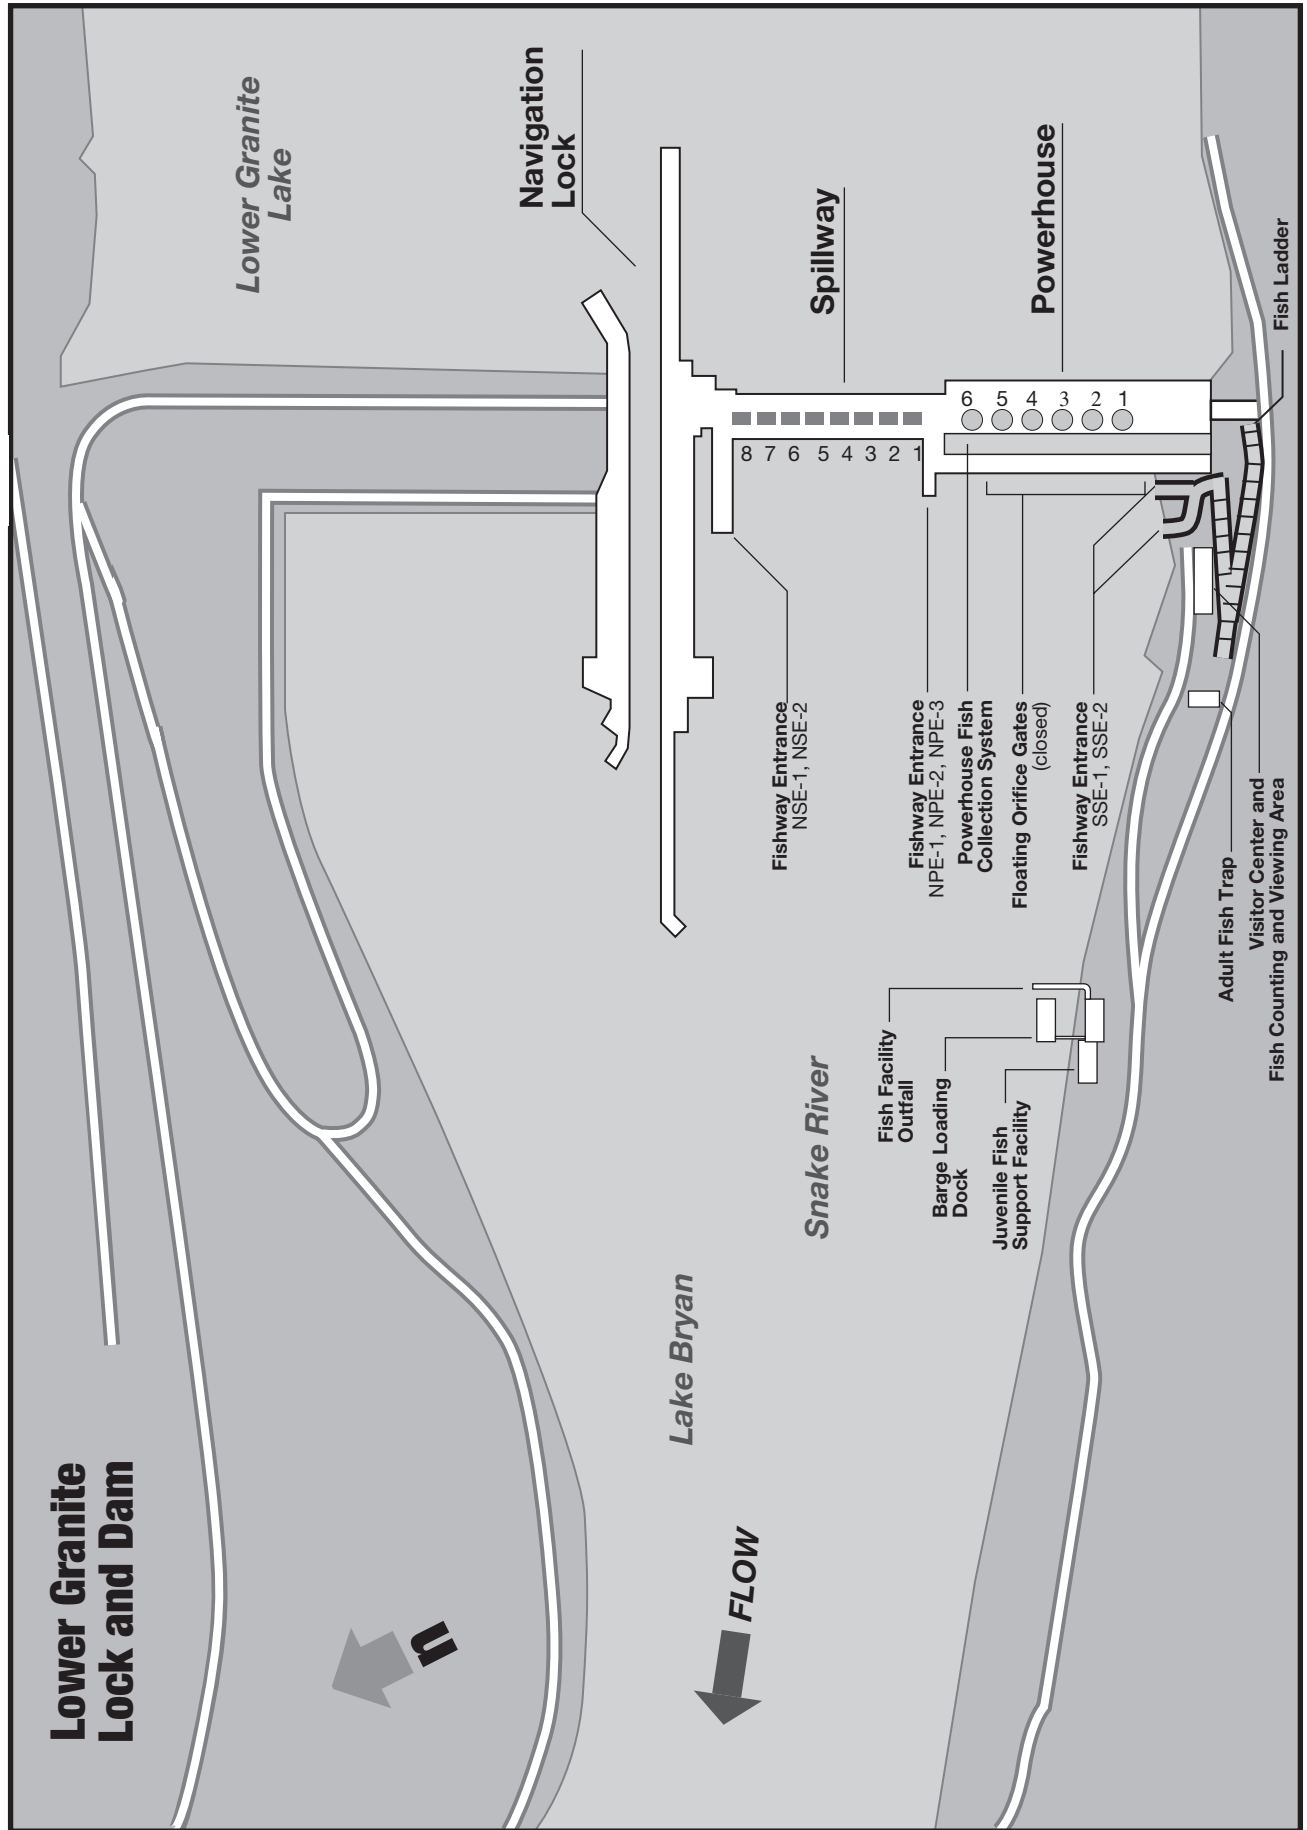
Lower Granite Lock and Dam general site plan.
